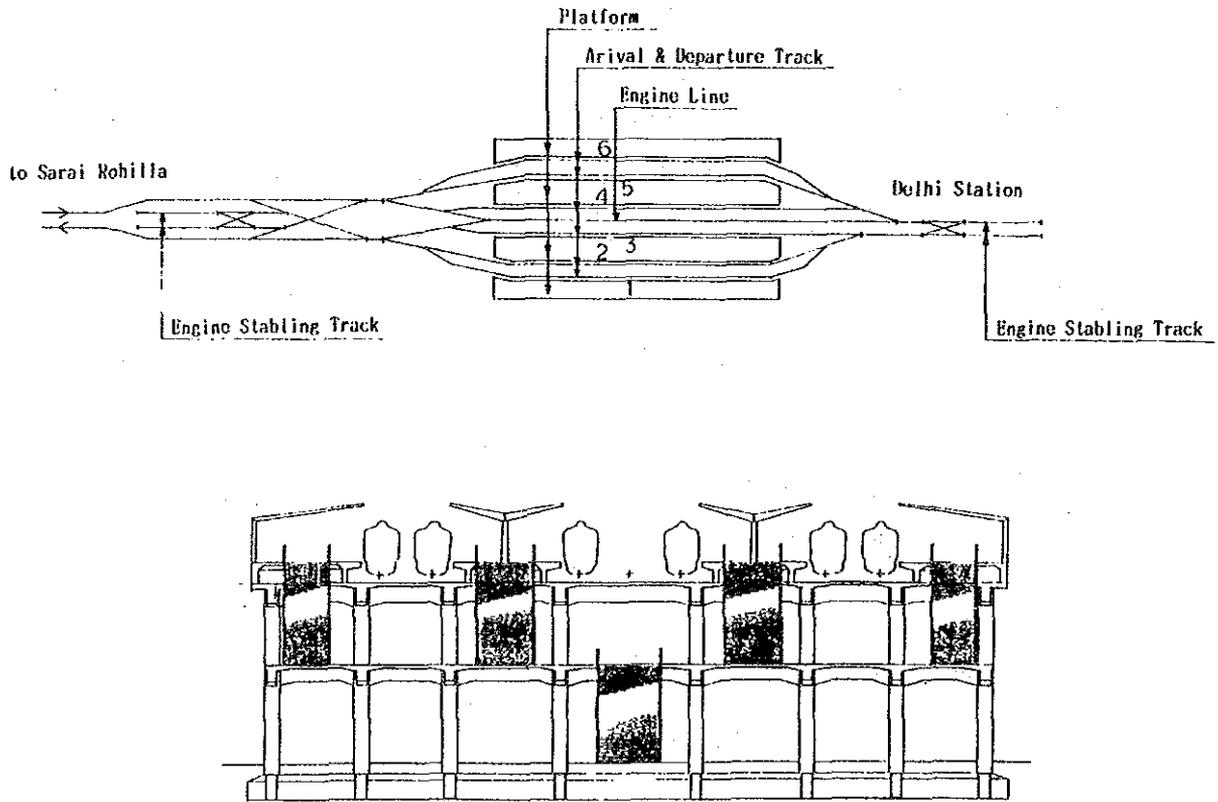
Conceptual Plan of the Elevated MG Station
